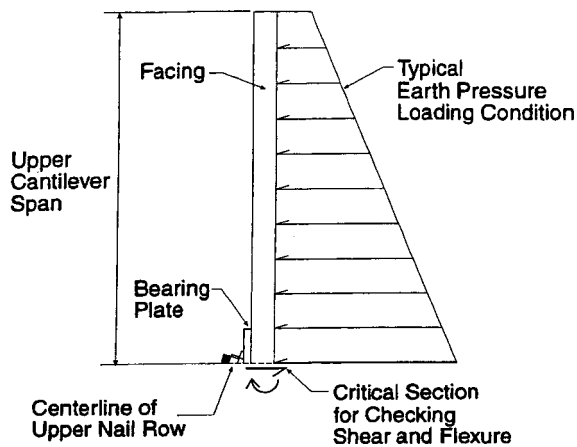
Upper Cantilever Design Check (Byrne, et al, 1996)
